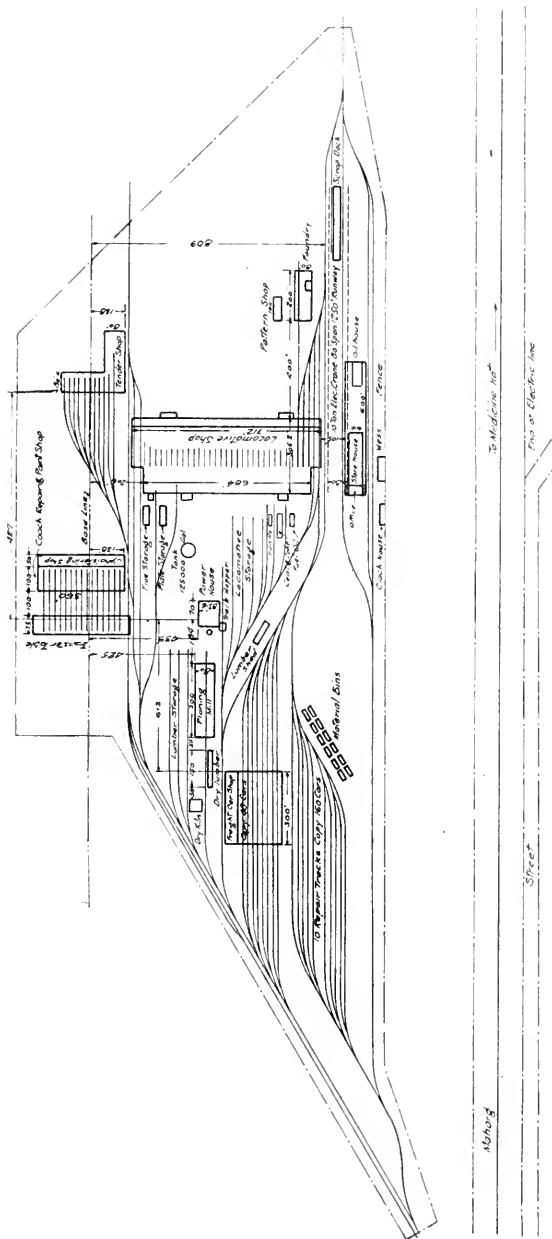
GENERAL PLAN OF SHOPS, CANADIAN PACIFIC RAILWAY, CALGARY, ALBERTA, CANADA.
